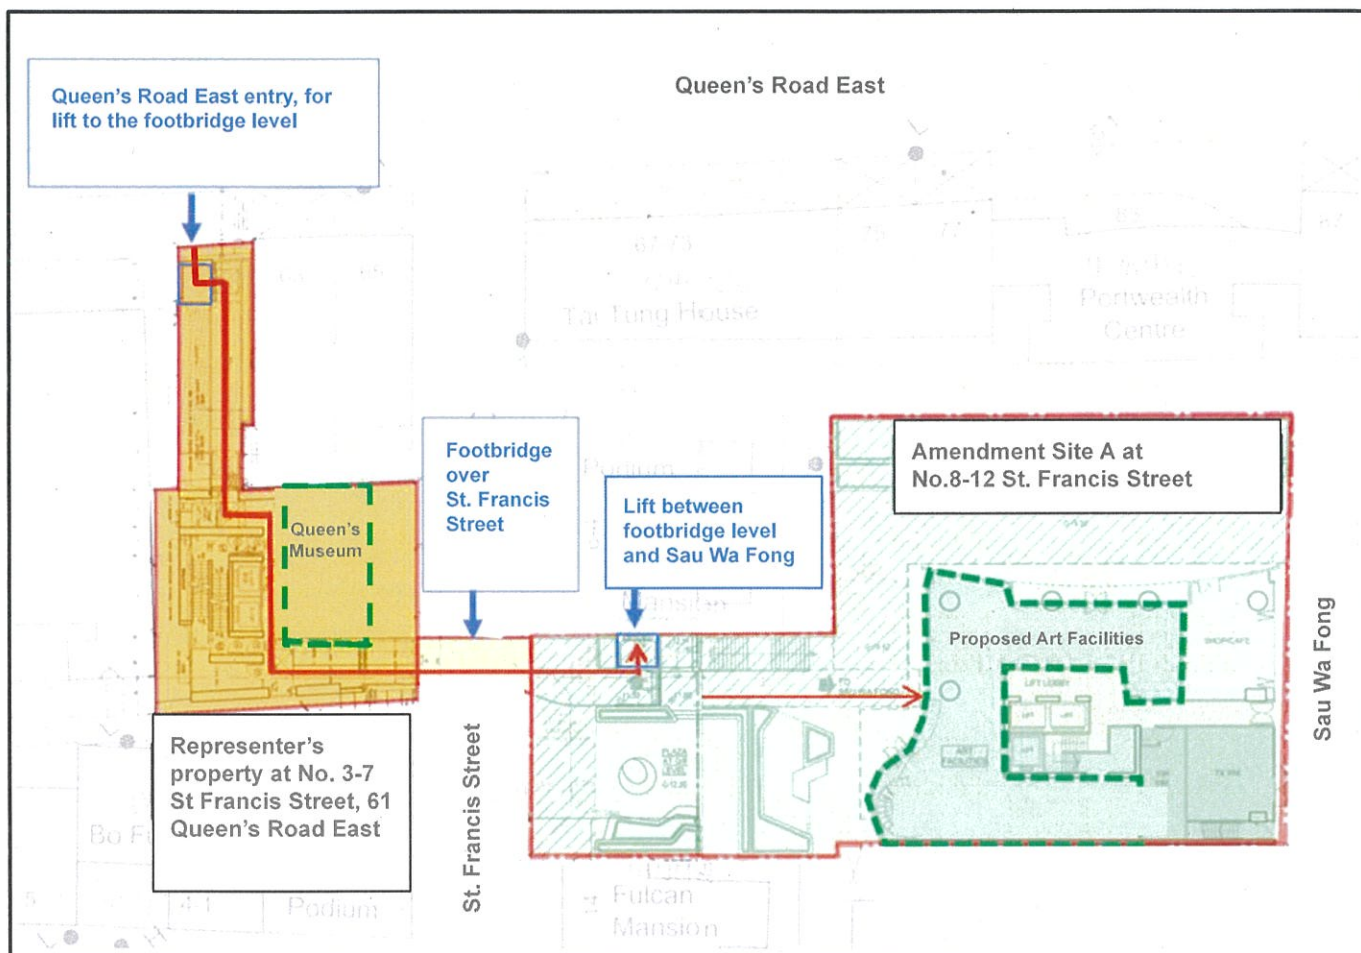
Diagrammatic plan indicating the envisaged footbridge over St. Francis Street, completing a comprehensive barrier-free and extensive pedestrian network between Queen's Road East and Sau Wa Fong.
